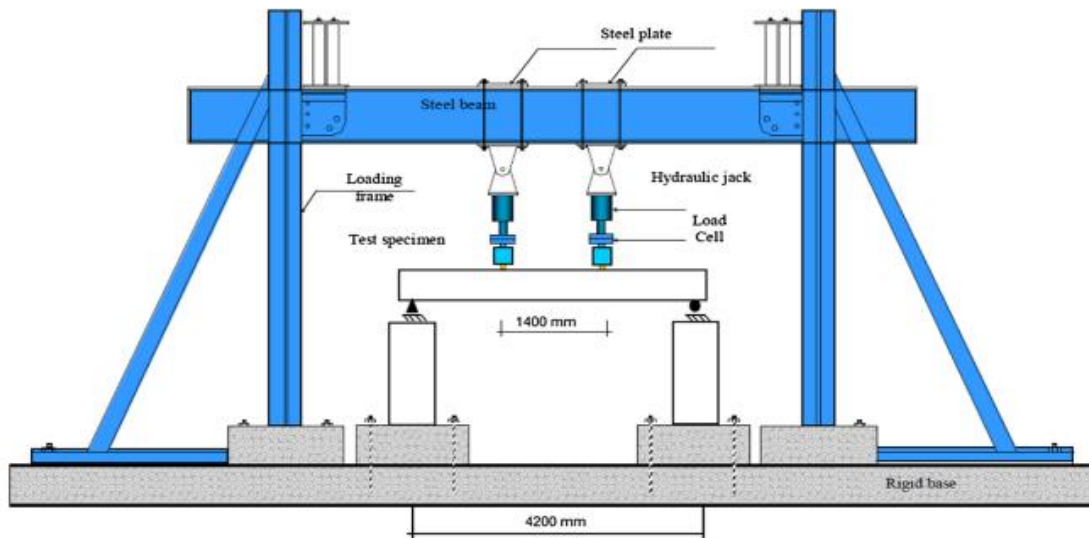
Test setup for tested beams (Moawad et al.,2016)
